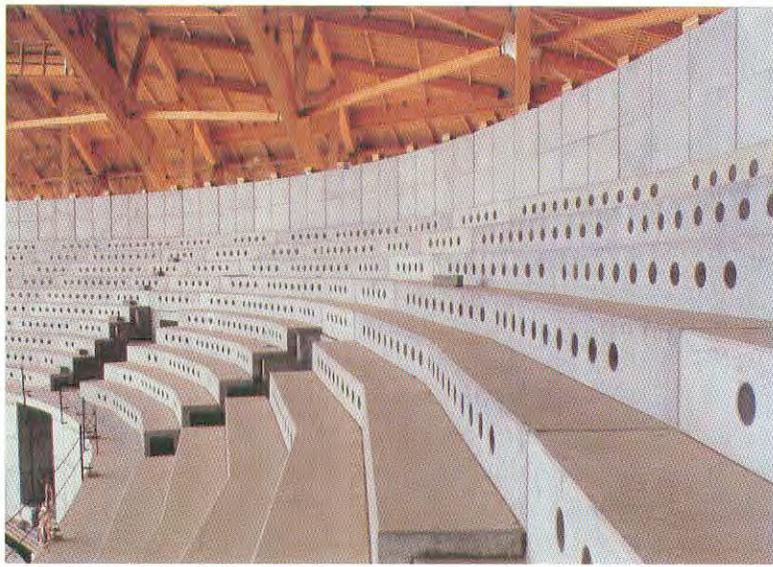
Glue laminated timber space truss provides the roof to a precast structure at Lisbon's Expo '98 site. (Courtesy Prègaia, Portugal)
